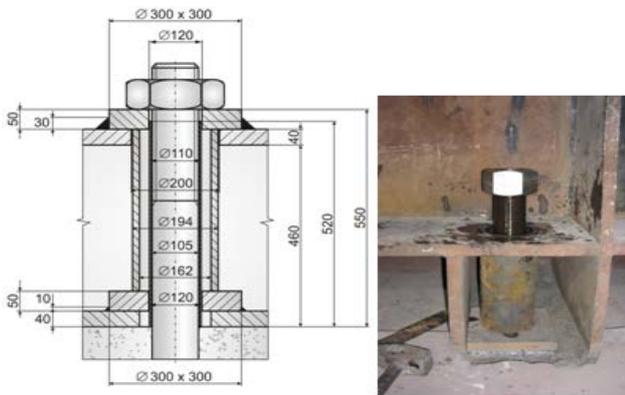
Reinforcing pipe of anchor bolt a) schema, b) practical realization
